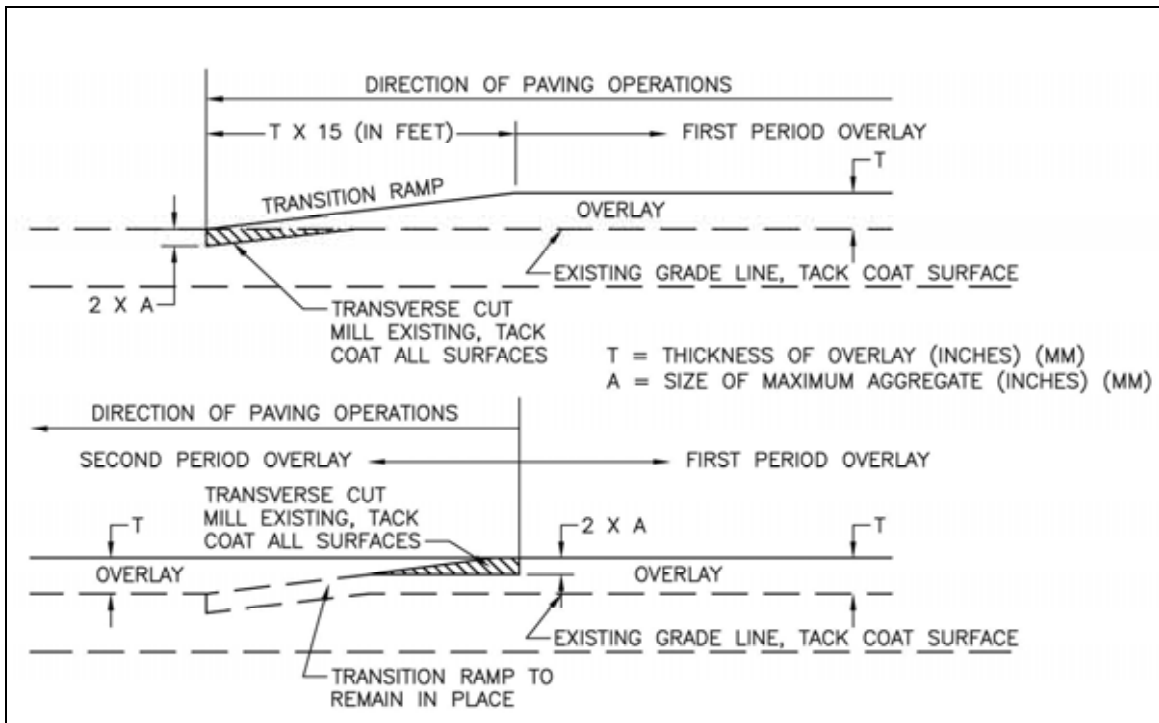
Transition Ramp Construction with Cold-Planing Equipment
